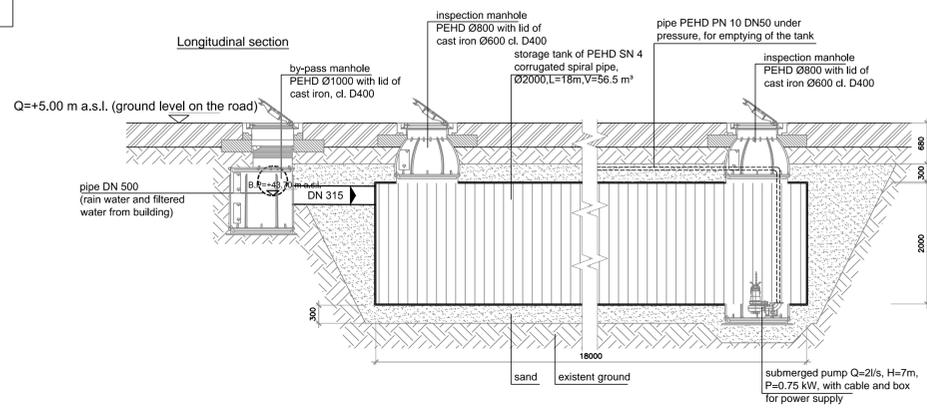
DETAILS OF TANK "V1" (FILTRATION SYSTEM ON UNDERGROUND LEVEL)
